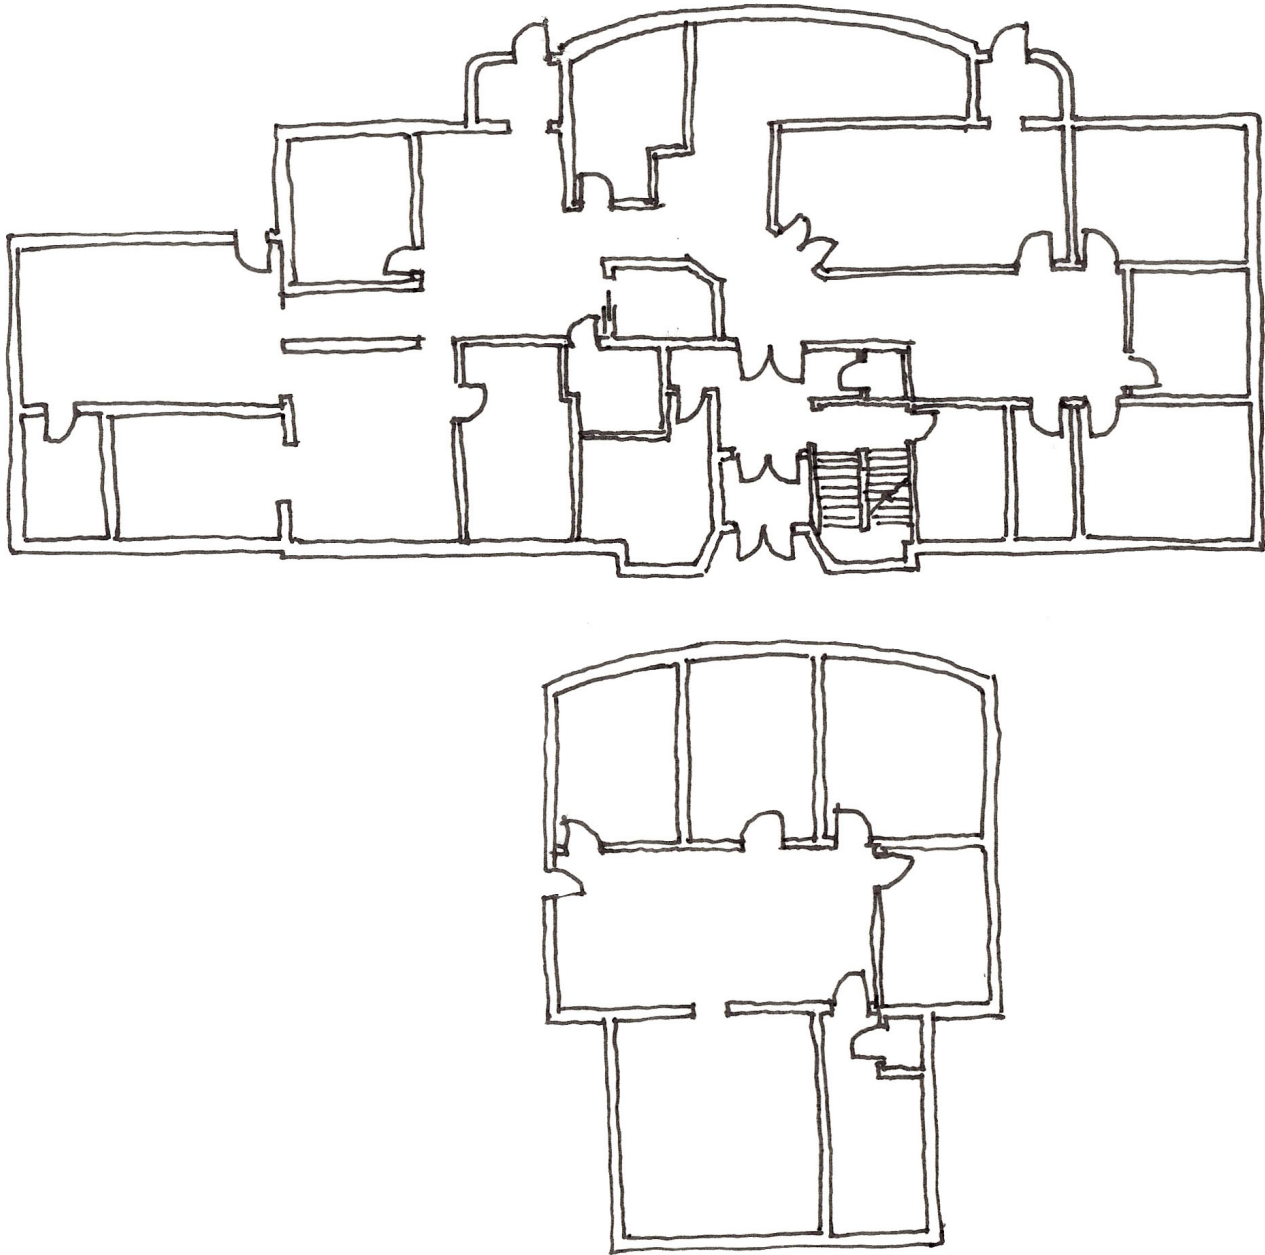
& 36: Sketch plans of present-day floor plans at the main and upper levels of the Brekke Building (former Administration Building)
